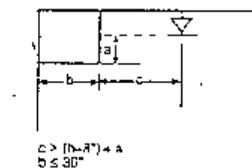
Horizontal obstructions against walls.
